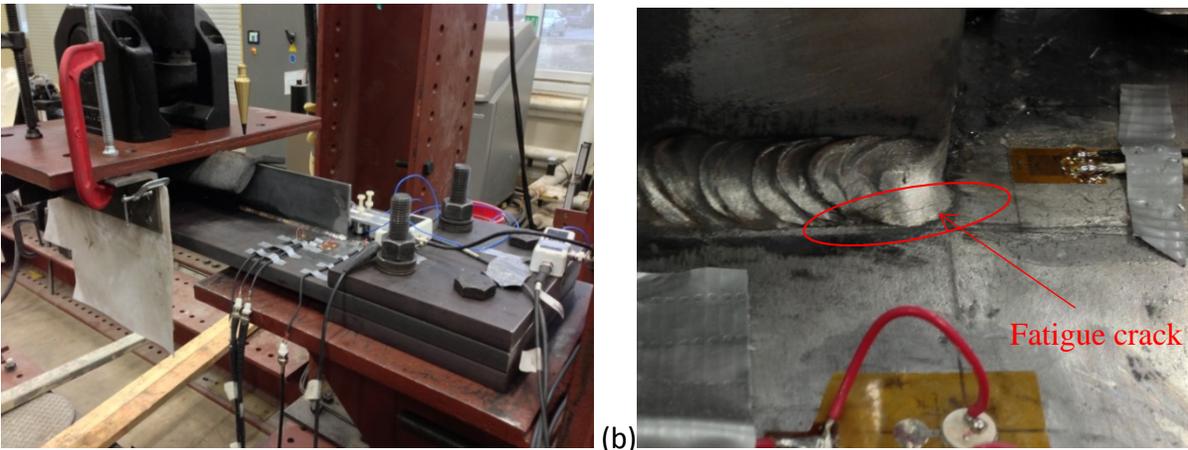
(a) Test setup for characterizing piezo film AE sensor on stiffened web plate specimen; (b) fatigue crack in the test specimen at load cycle number $N = 182,000$
